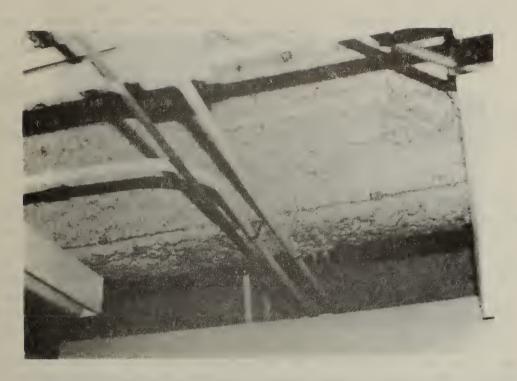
Damage to fireproofing on structural steel due to electrical system modifications
